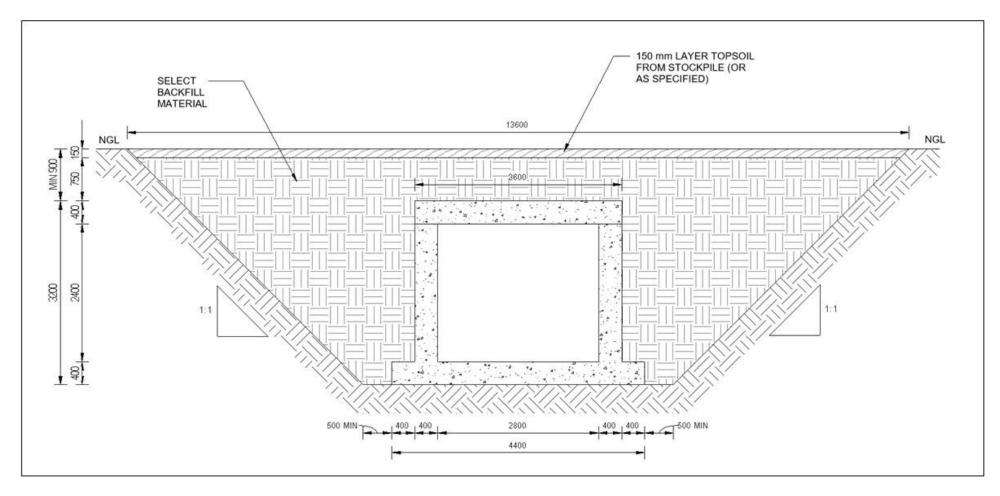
Typical cross section of Syphon 2 - rectangular portal culvert
